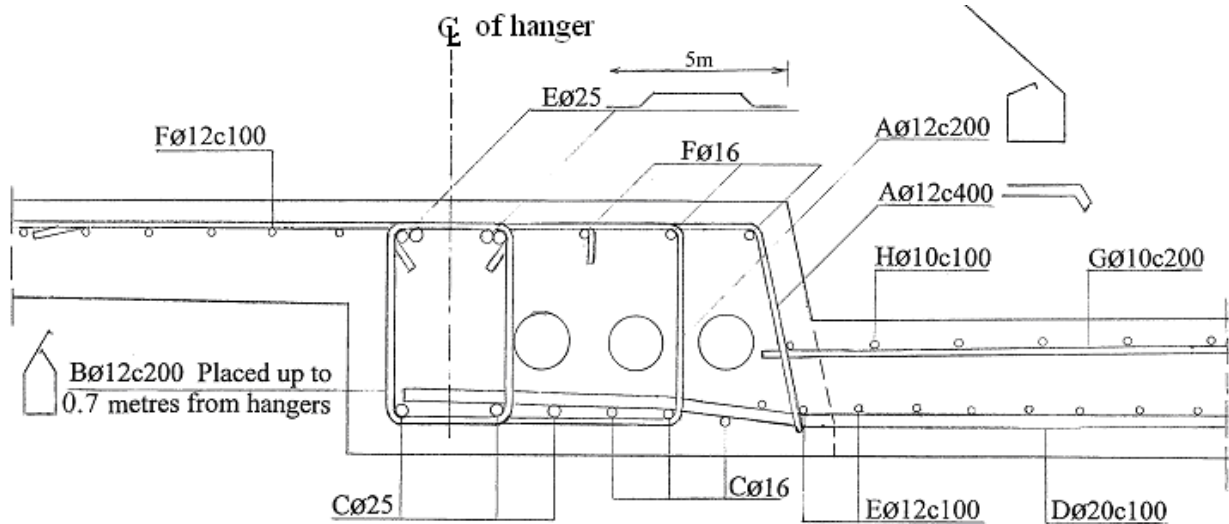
Reinforcement in the edge beam nearest to the footpath in the proposed Skodje Bridge
